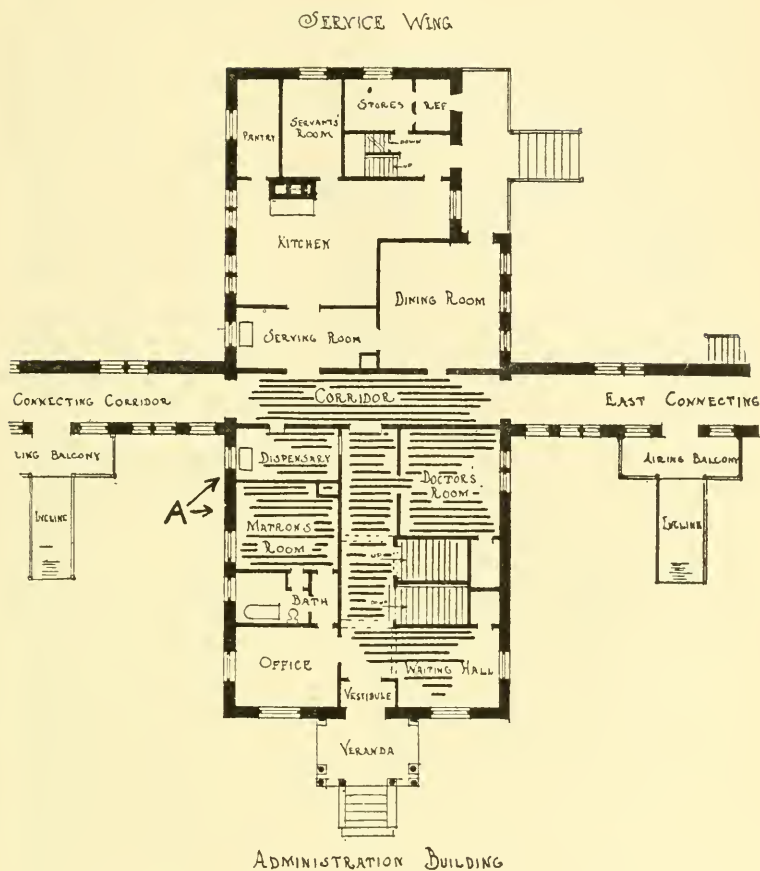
Plan of the first floor of the administration building. The infestation on this floor extended through the area shaded in horizontal lines.
